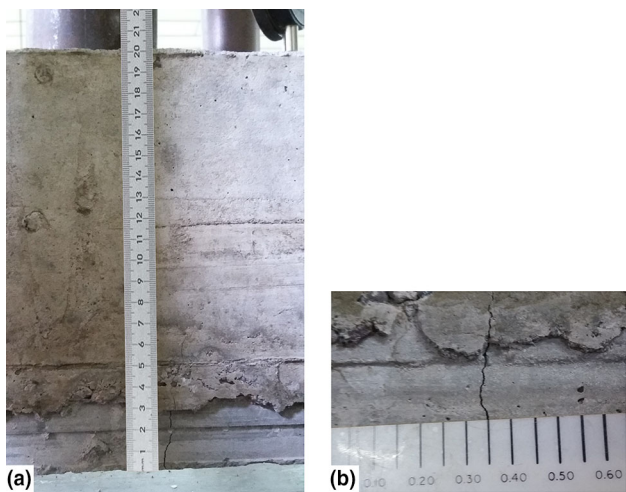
Measurement of the crack in Beam 01. a Depth. b Maximum width
